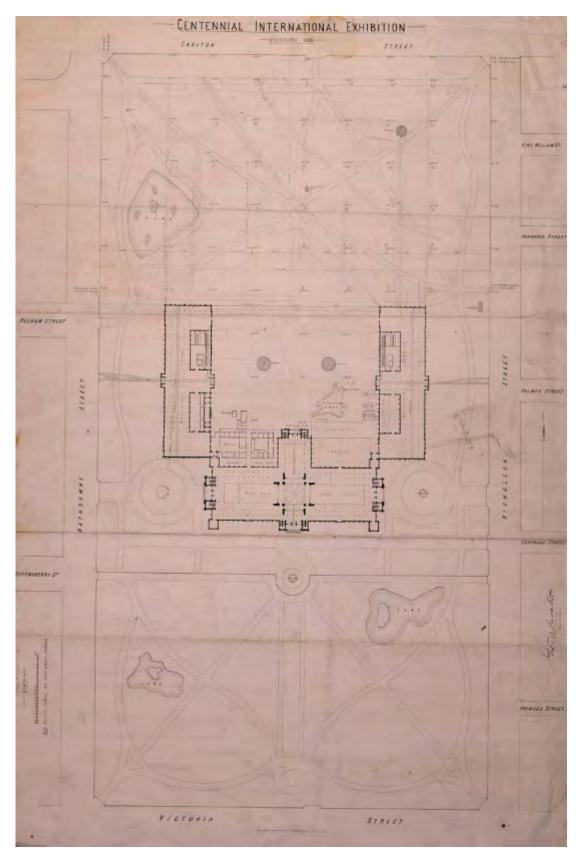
Railway Department plan of the Exhibition Buildings and Carlton Gardens dated 1887 Source: Lovell Chen archives
